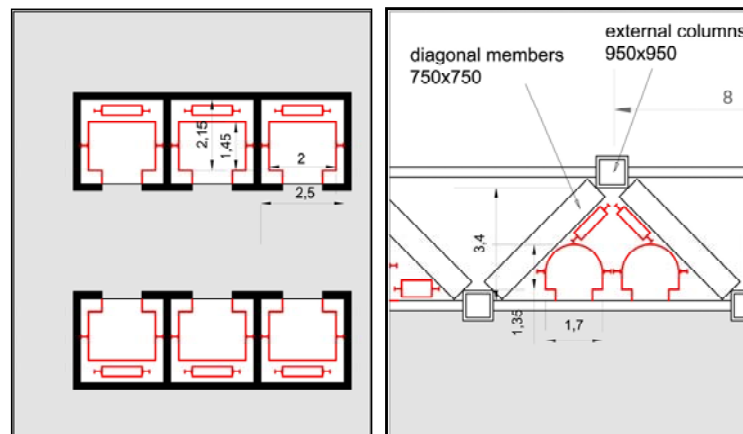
(a) Six local double-deck elevators; (b) Two double-deck shuttle elevators in one structural module
